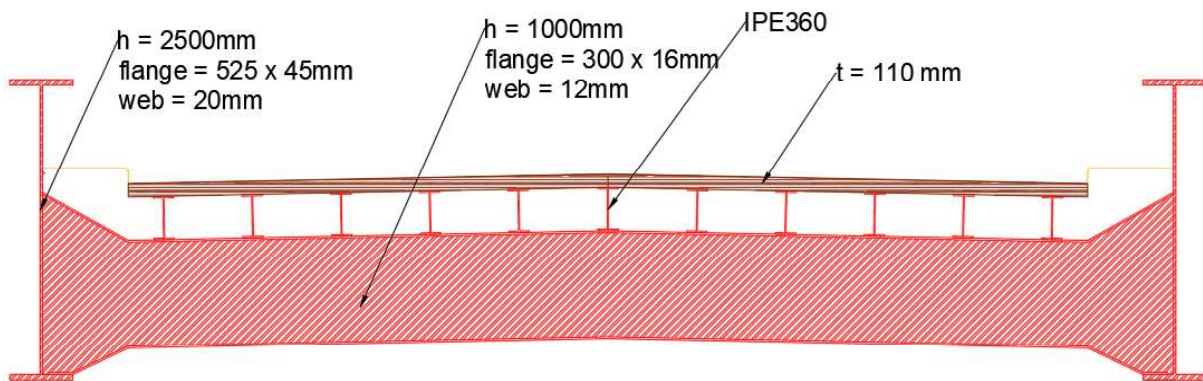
, Cross section MS base variant, steel main- and crossbeam with wooden deck.
